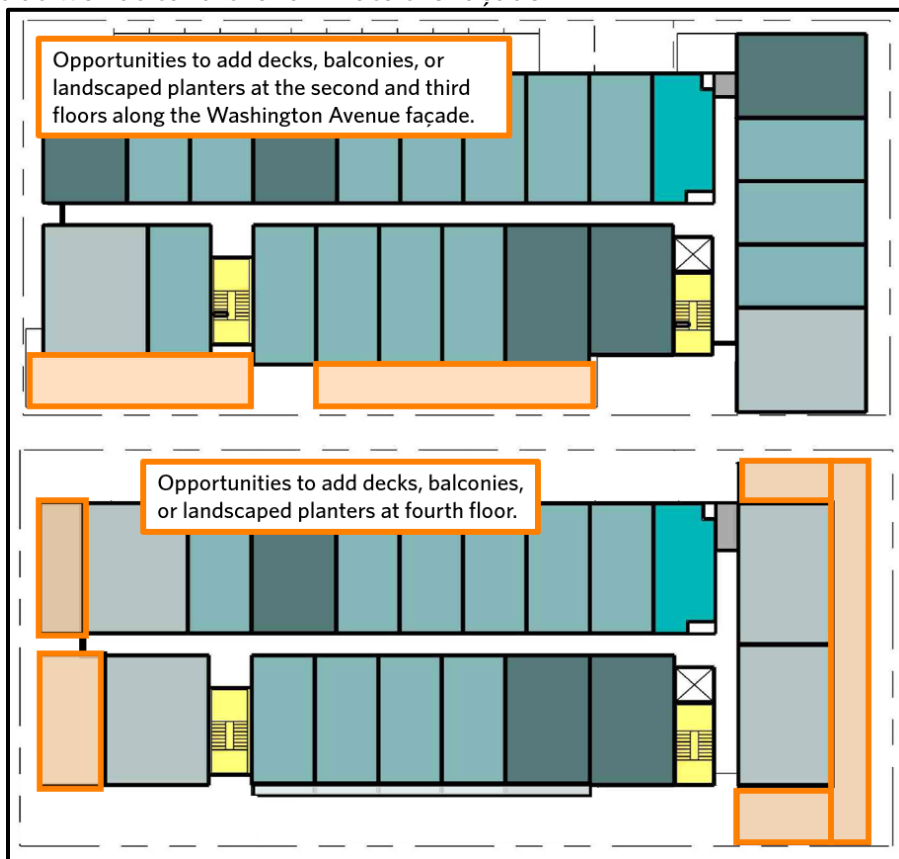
Opportunities to Add Decks, Balconies, or Landscaped Planters at Upper Floors
